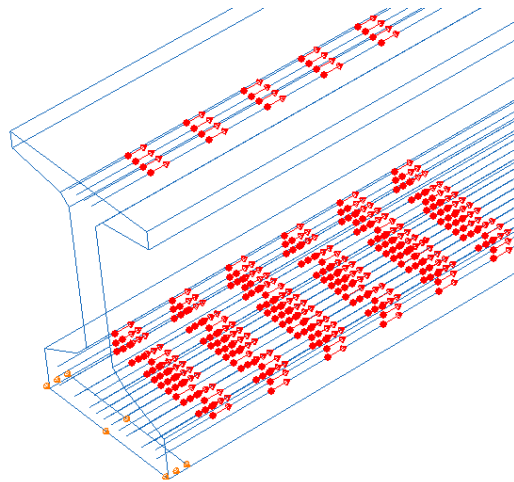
Prestress force at different locations for girder with debonded strands.
